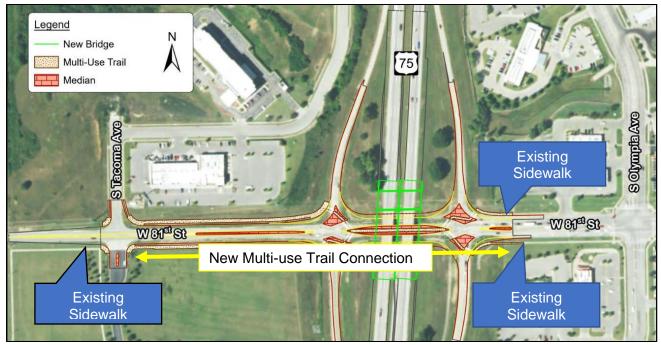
Proposed Connection of Existing Sidewalks on W. 81st Street
